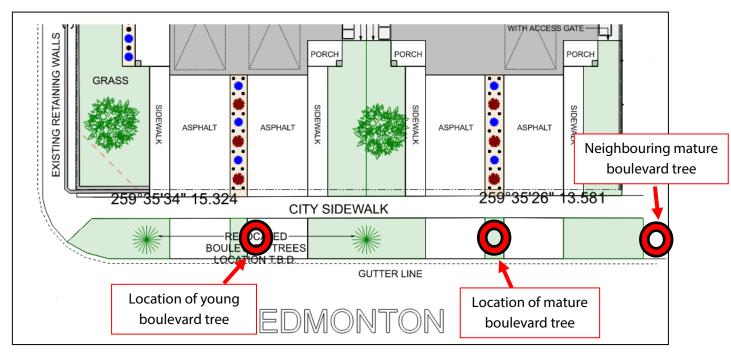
Submitted landscaping plan showing relocated boulevard trees, with existing tree locations shown in red.
